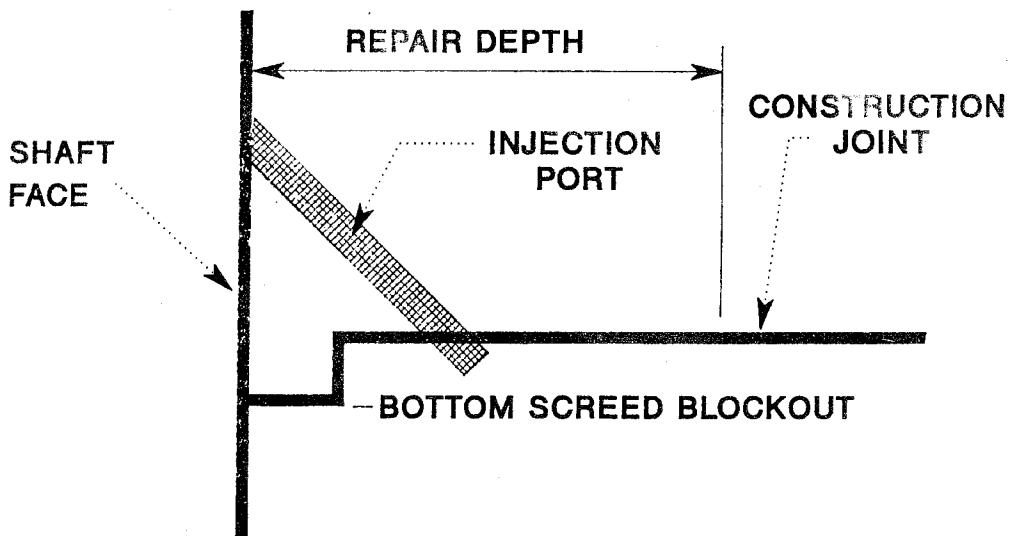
Sketch of epoxy injection joint detail, Warm Springs Dam
